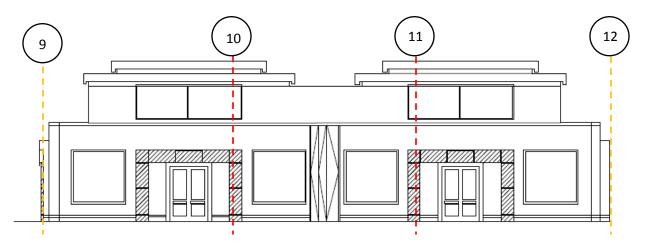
North Elevation of Ballroom | Proposed Location of Clerestories
